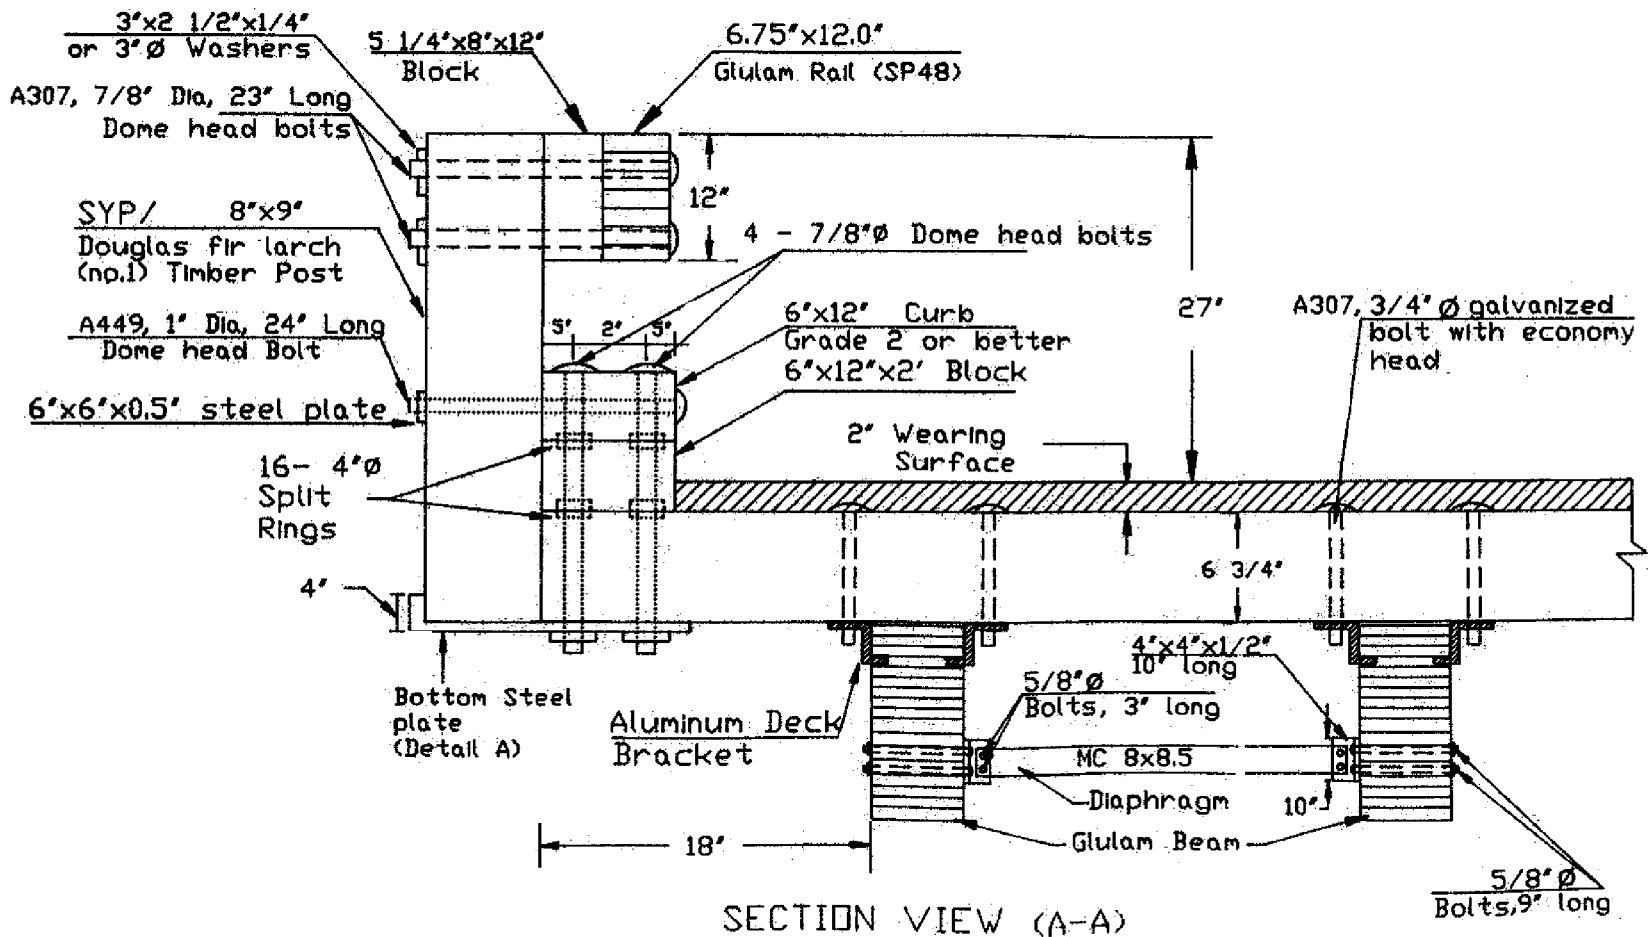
Timber Bridge Rail, System 2 (100,99).
